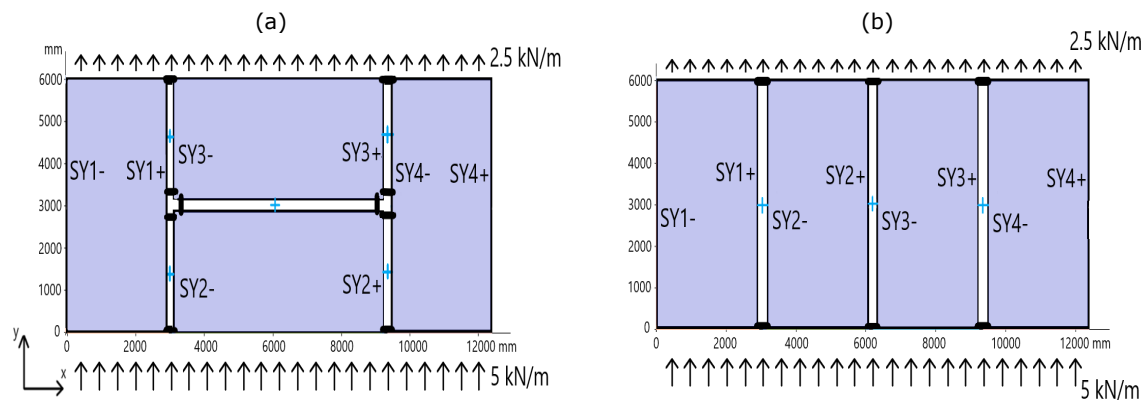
Two building layouts of the 6th story timber modular building compared with each other in terms of lateral load distribution.
